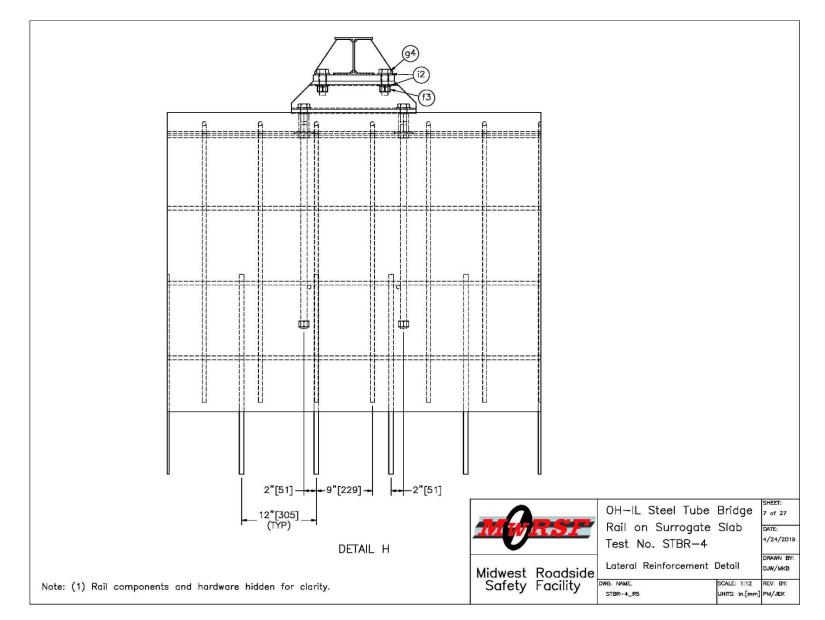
Lateral Reinforcement Detail, Test No. STBR-4
